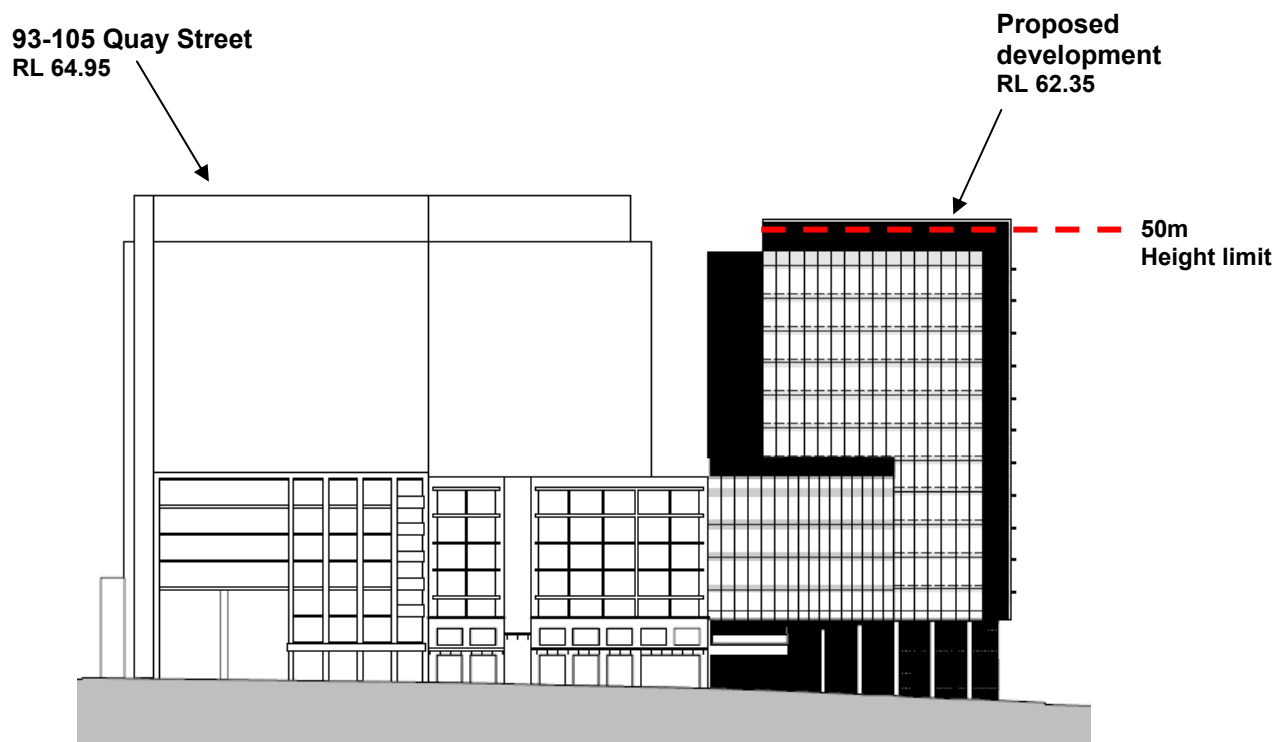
East Elevation (Quay Street) showing the proposed development and height relationship to adjacent building (93-105 Quay Street)
